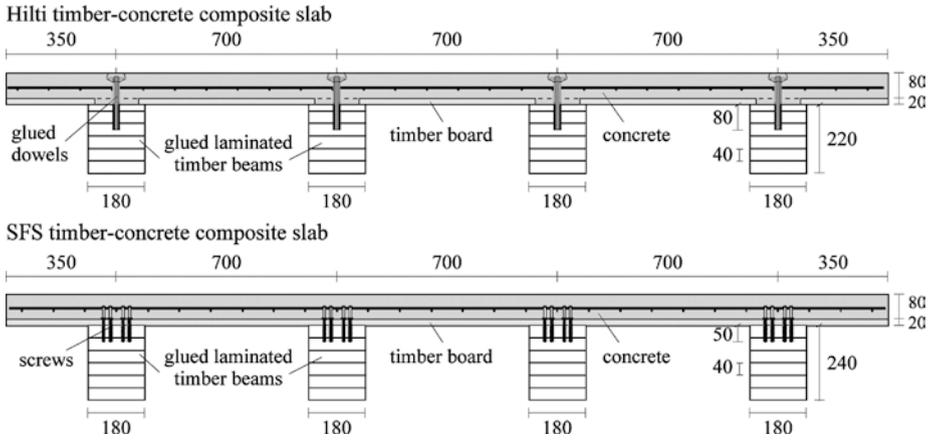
Cross-sections of the beam-type slabs: one with grooves and Hilti glued dowels and one with SFS screws exposed to ISO-fire
